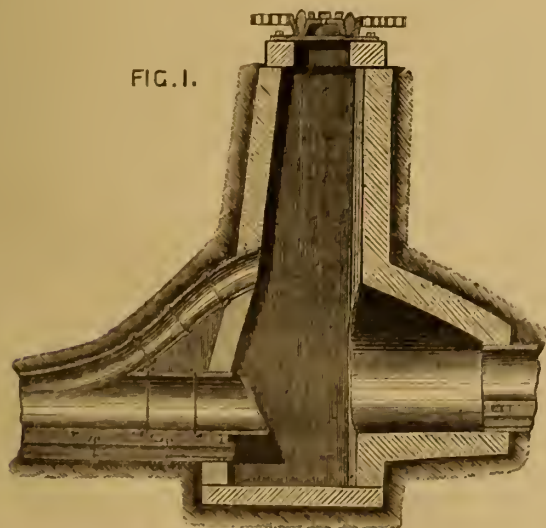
Showing section through manhole, with flushing valve and subsoil drain.
